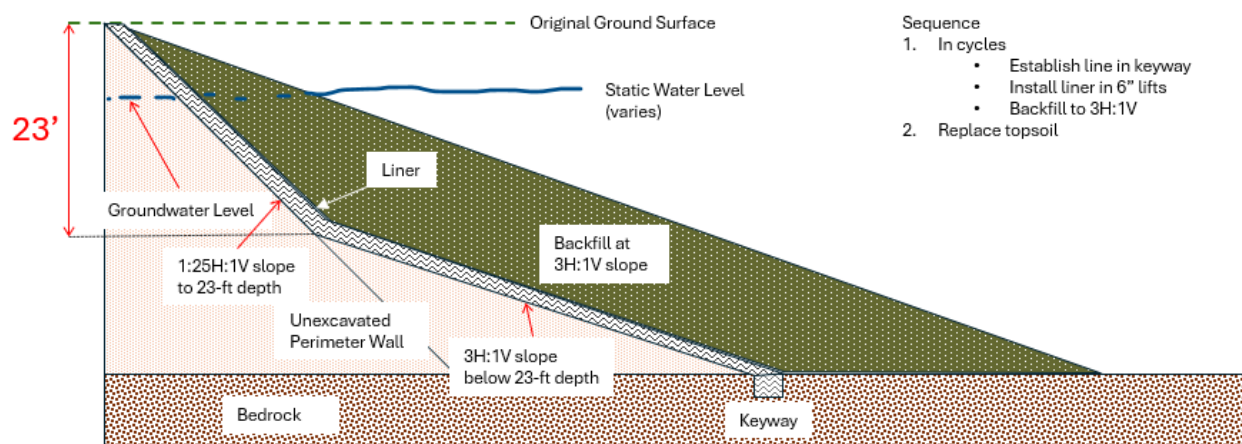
Typical Completed Reclamation Liner and Regraded Slope for Extraction Limit Wall<sup>9</sup>
